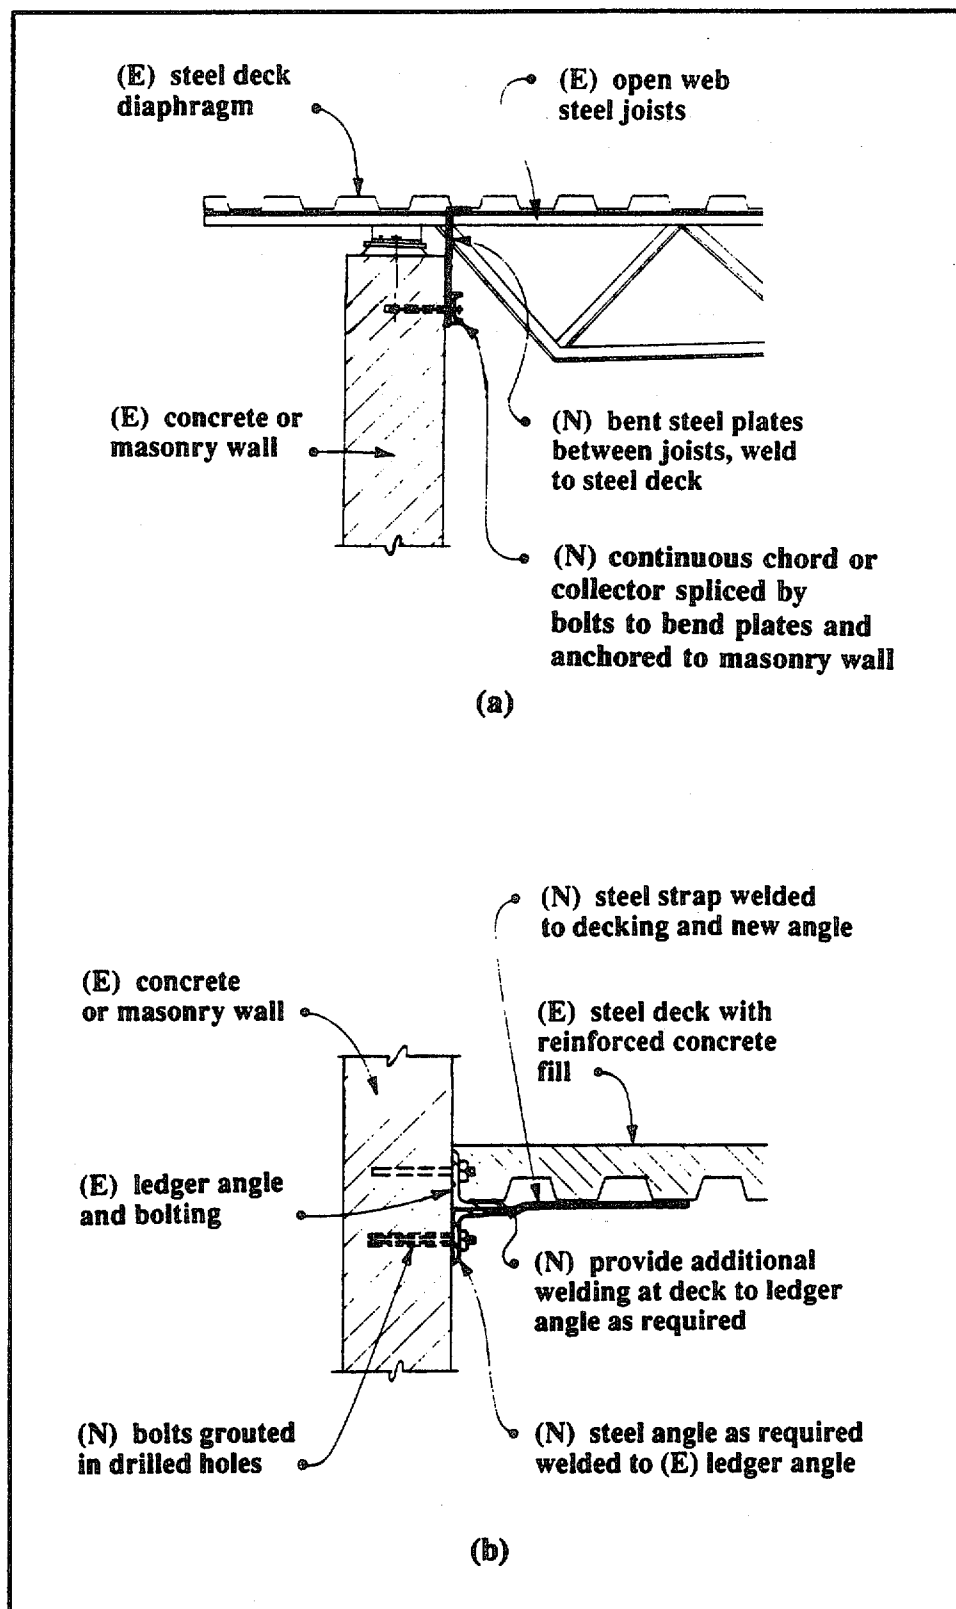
Strengthening the connection of a steel deck diaphragm to a concrete or masonry wall.
